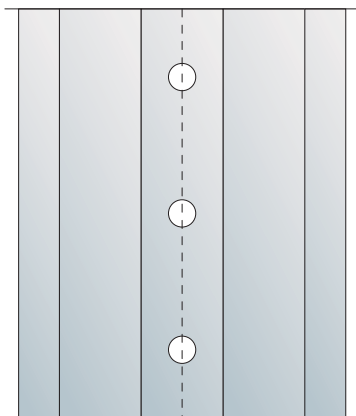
Penetration Positioning and Sizing for both Horizontal and Vertical Panels.
